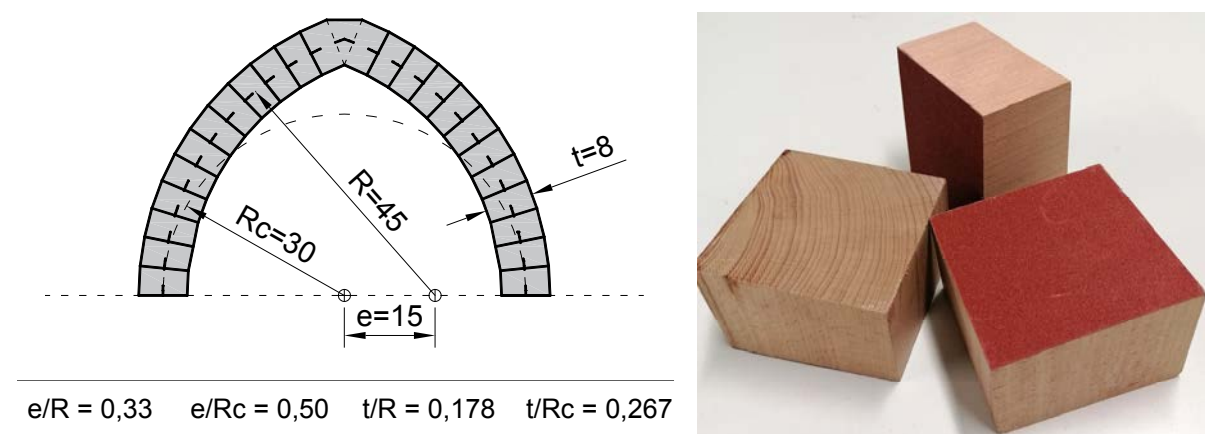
Geometry of the pointed arch (dimensions in cm) and timber blocks.
